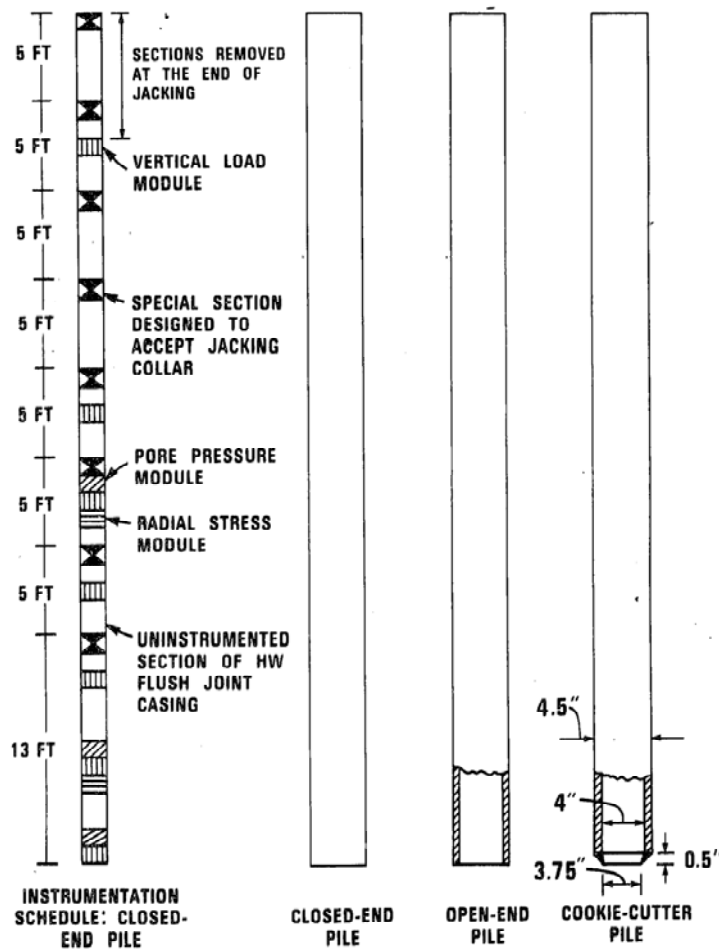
Schematic layout of pile instrumentation, Hamilton
